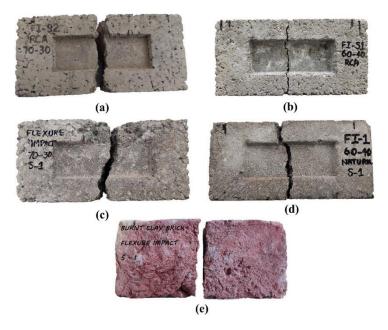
Failure modes of bricks in flexural impact test (a) RAC-70C30F brick (b) RAC-60C40F brick (c) NAC-70C30F brick (d) NAC-60C40F brick (e) Burnt clay brick.
